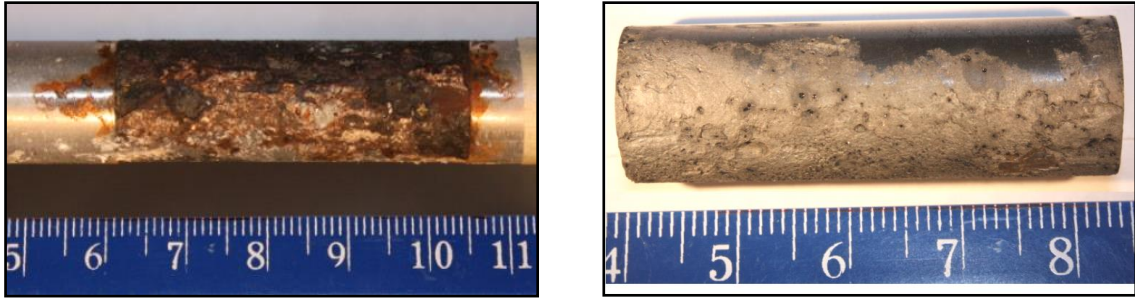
Carbon steel segment of the localized rebar corrosion case of C/L=1 for specimen 103 before and after chemical removal of rust. The cleaned specimen revealed partially corroded surface area (for random clock positions)
